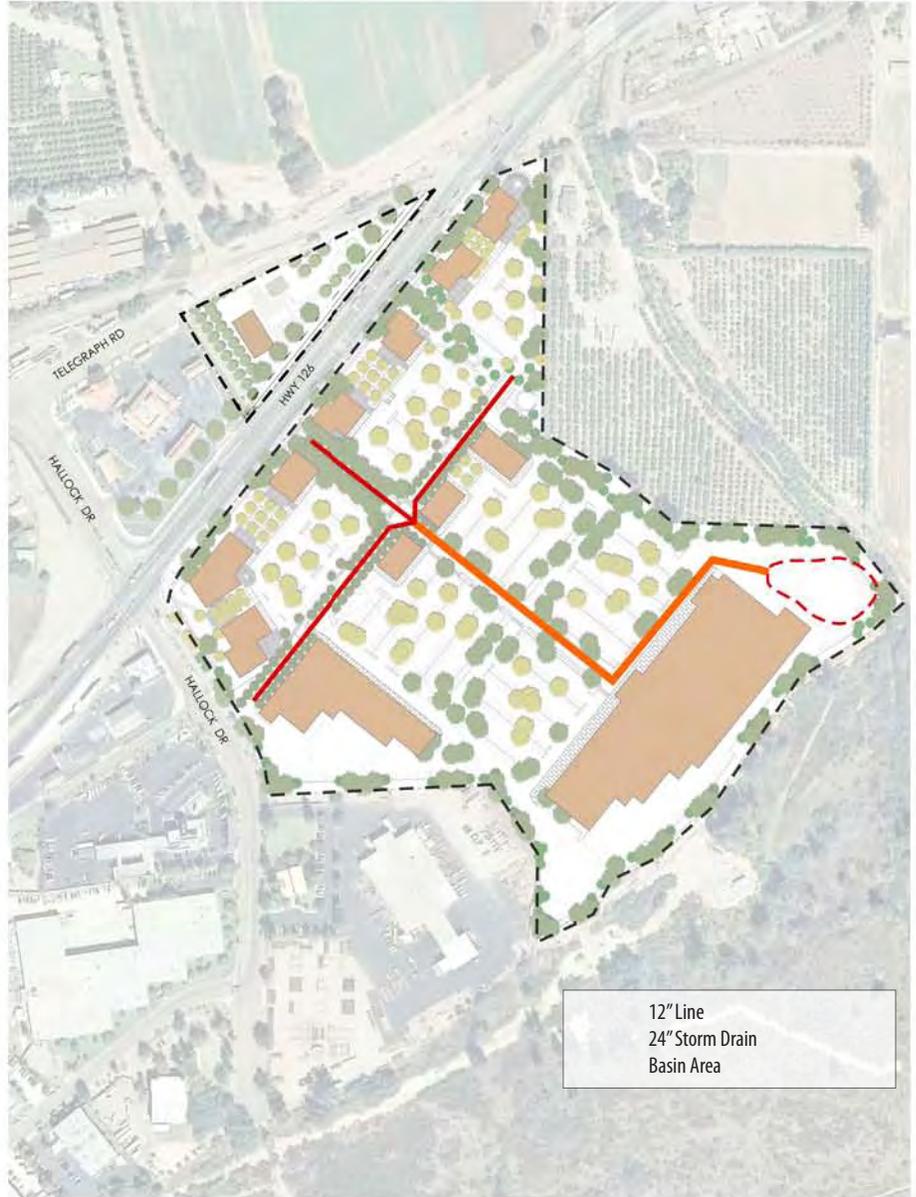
Conceptual Drainage Plan (Alternative B)
